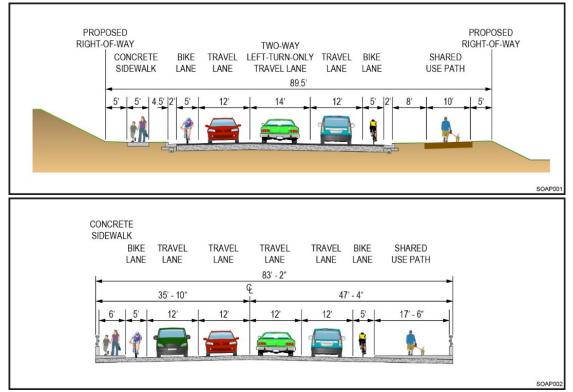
Soapstone Connector Roadway and Bridge Typical Sections
